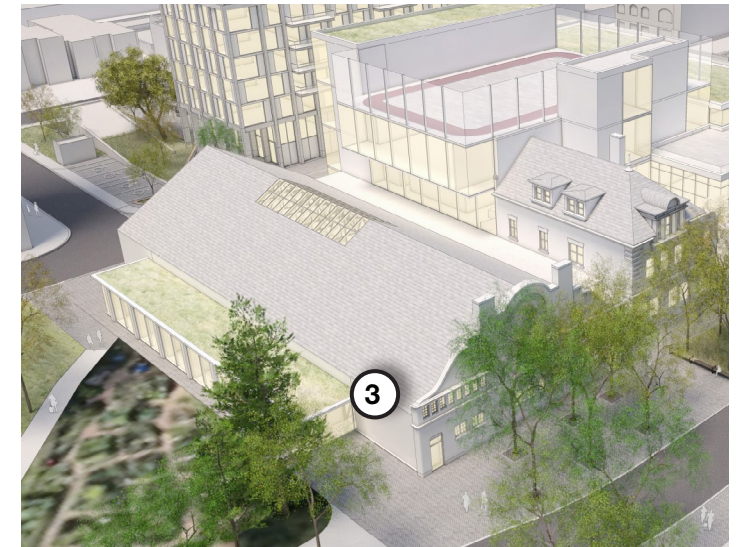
/ Proposed north west view on Cowan Avenue showing east elevations and Masaryk Park interface.
